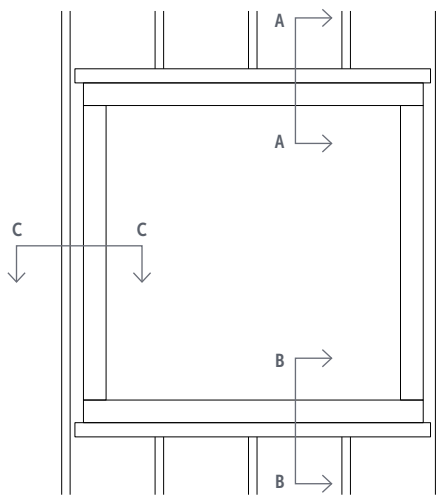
Section A-A Head & Sill Flashing To Be
